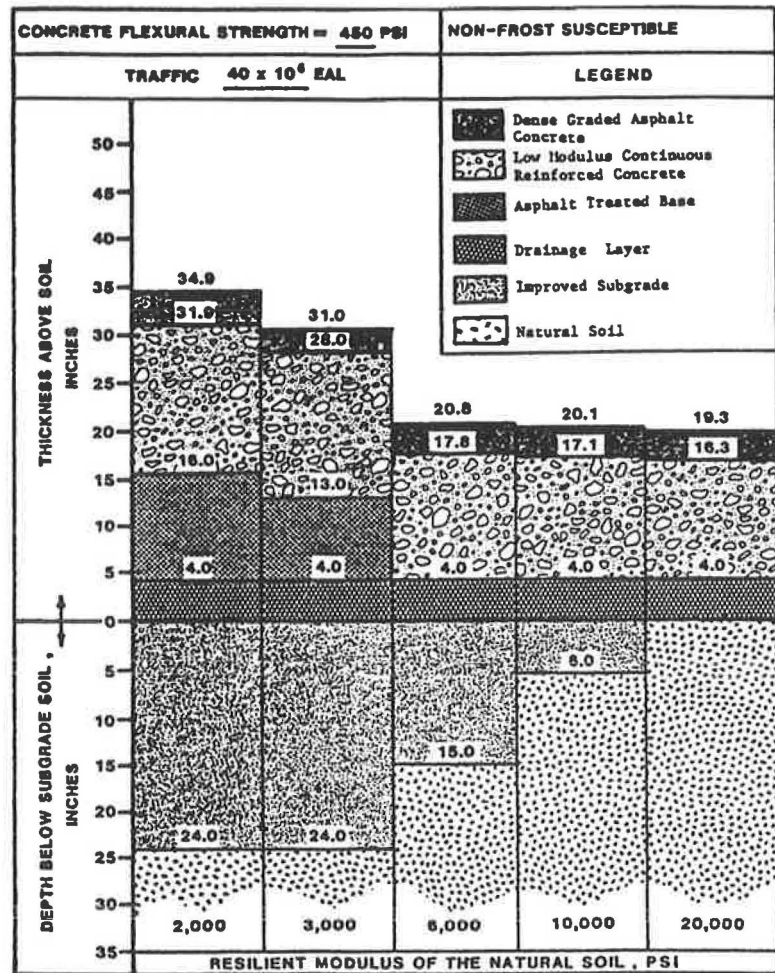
Composite pavement cross sections: low-modulus CRC base.
